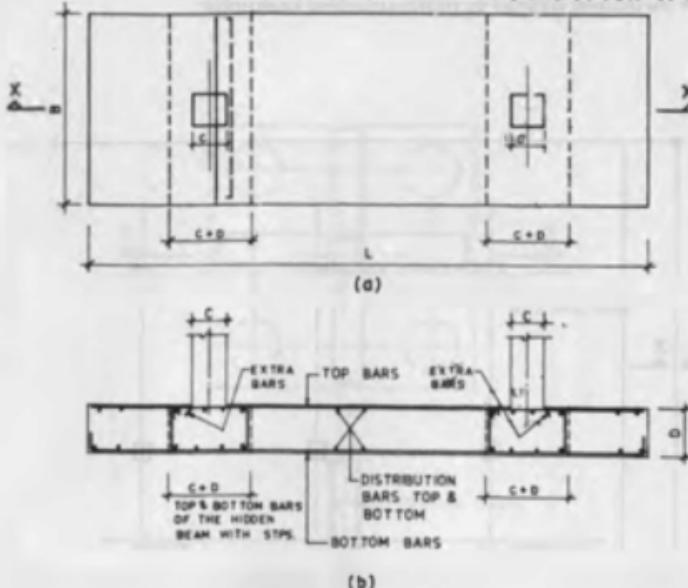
Slab-type combined footing. (a) Plan of footing; (b) Section X-X.
